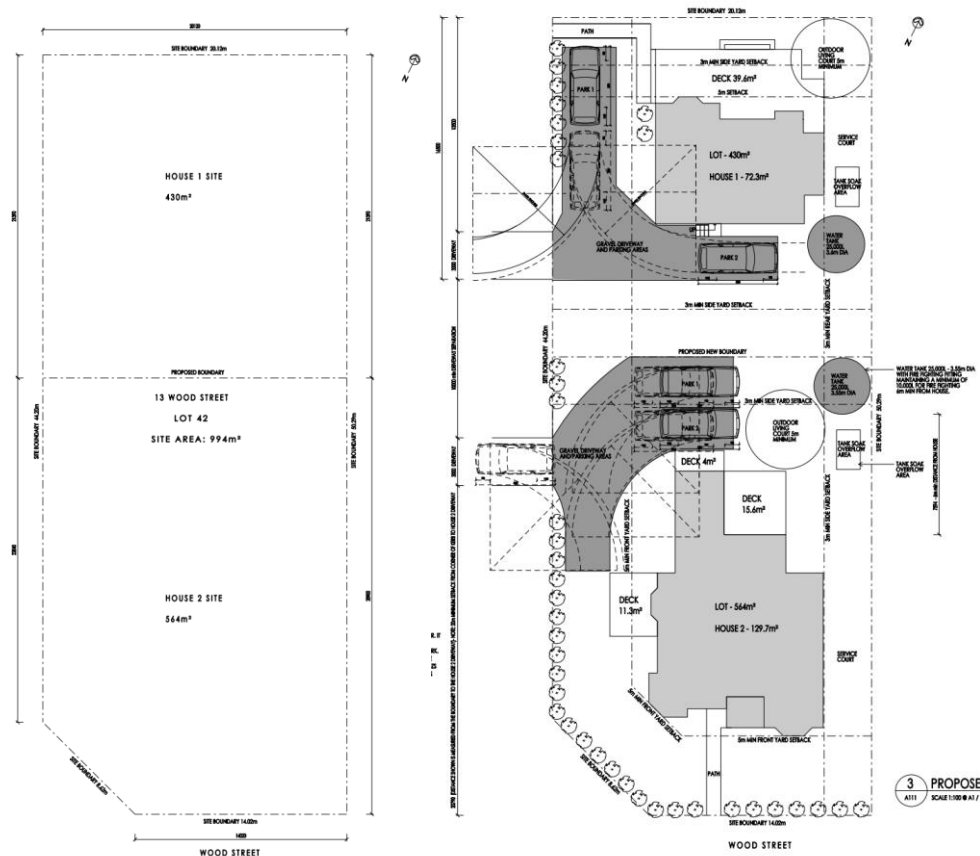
Amended application showing proposed Lots 1 & 2 with building footprints and site layout.
